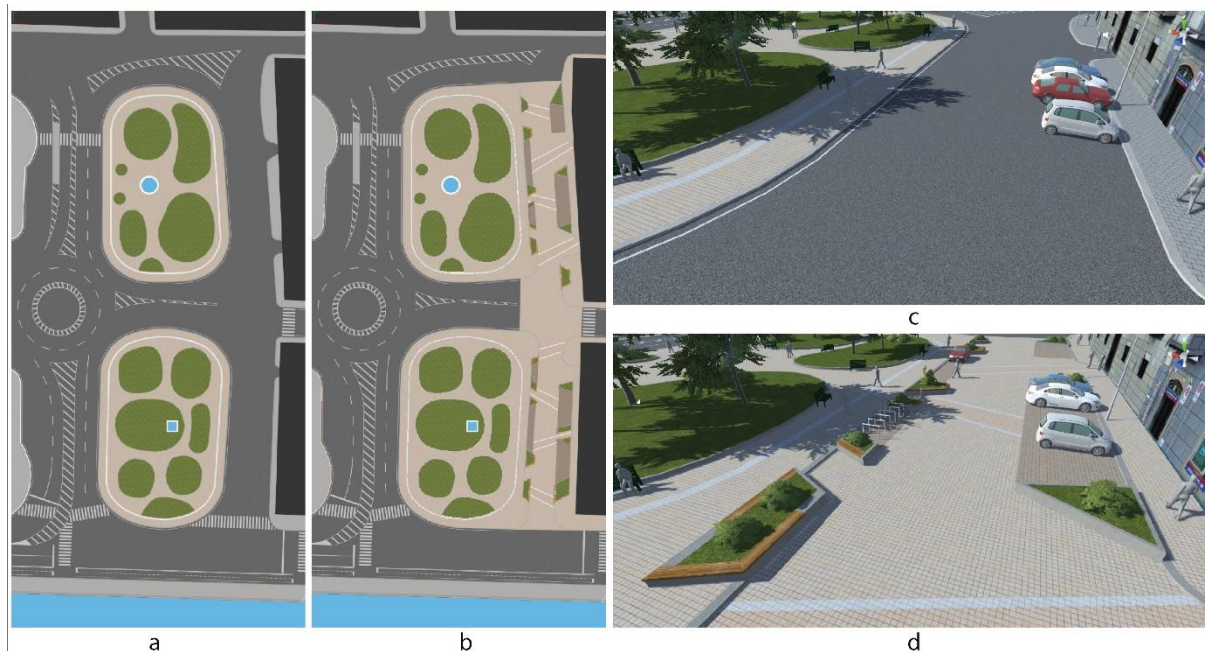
The two street-design scenarios: a. existing streetscape top view; b. shared-street design top view; c. existing streetscape bird's-eye view; d. shared-street design bird's-eye view. (Greyscale print)
